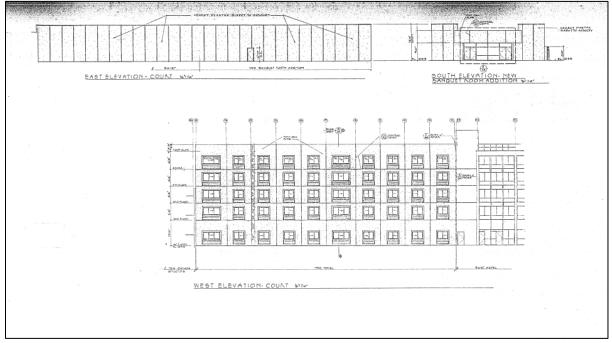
East, south, and west elevations, 1984 (Rissman & Rissman Associates)
